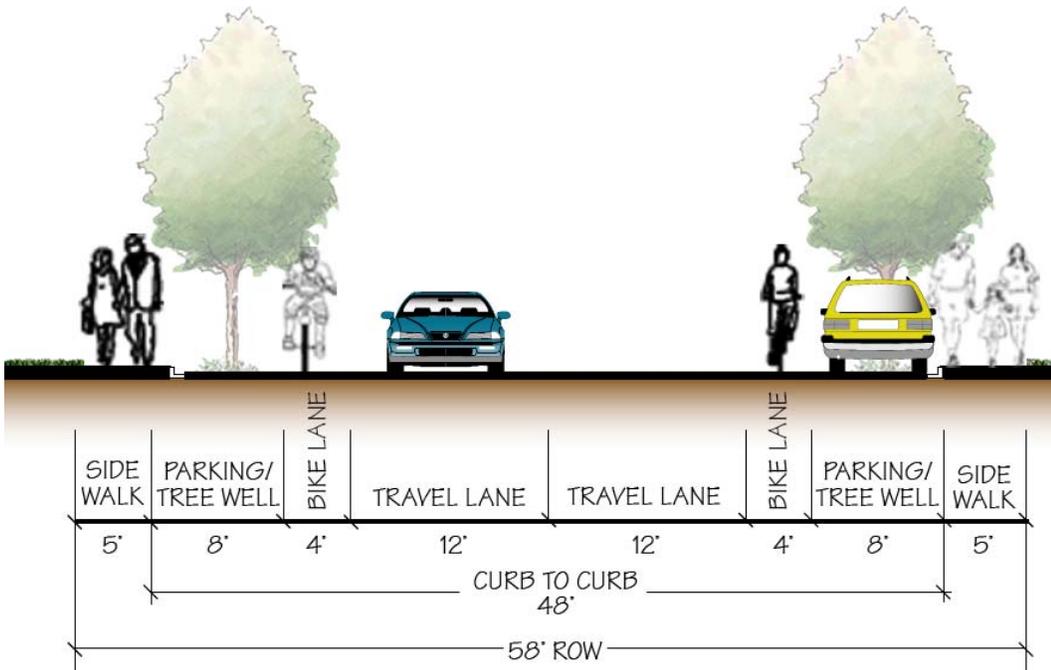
Herdal-Werner Connector Segment 2 Plan View (Section B-B from Figure 5-1)
